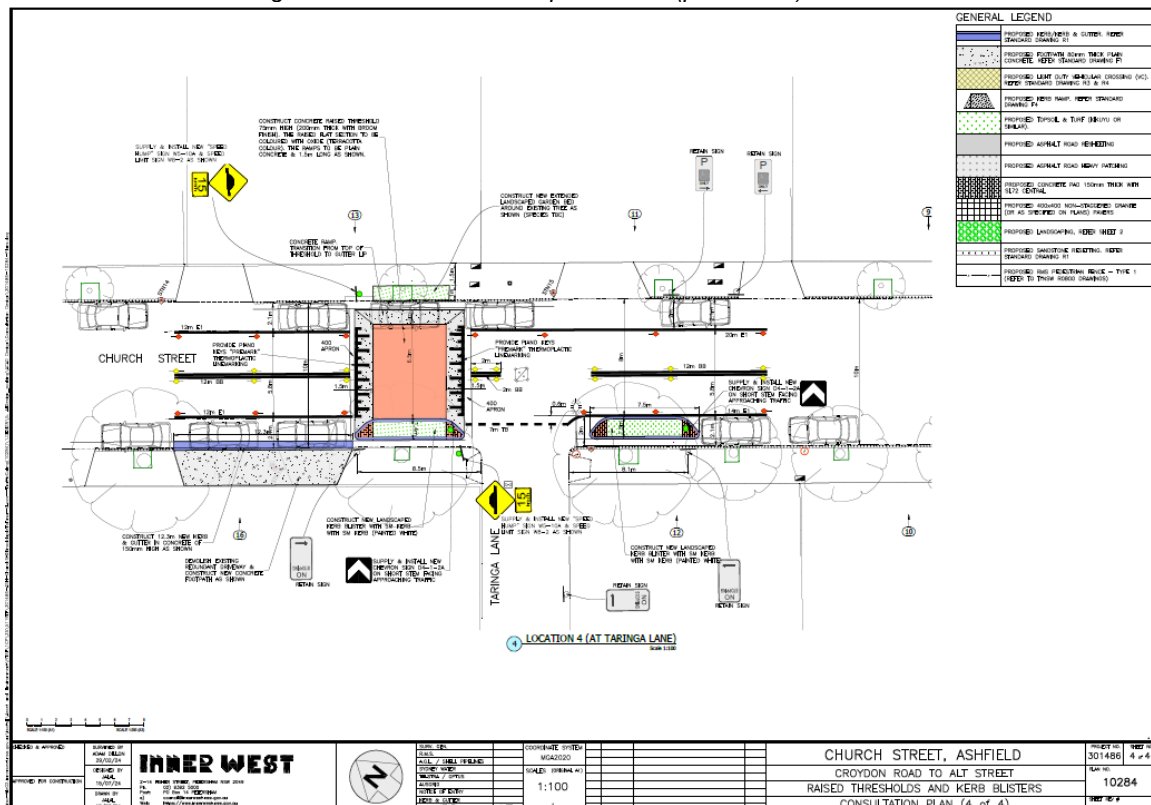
Initial consultation plan 10284 (plan 4 of 4)
